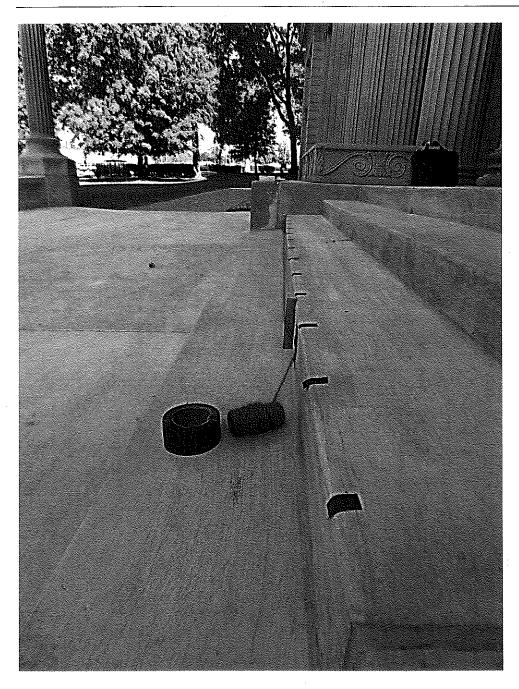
Overall photo at north section Stairway A, measurements of second riser
